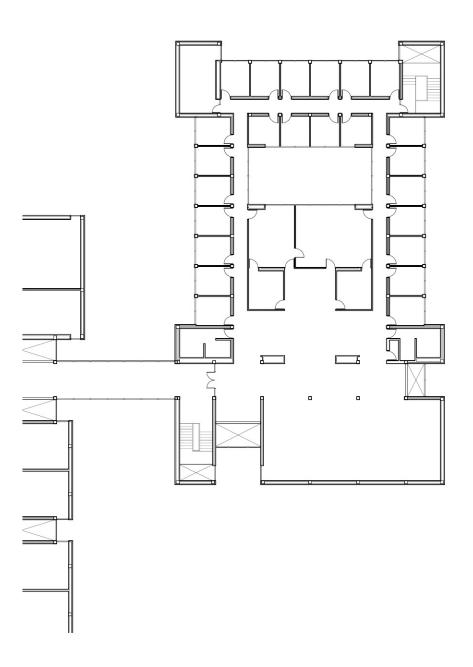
Antecedental Context - Second Floor Plan - Part 2
